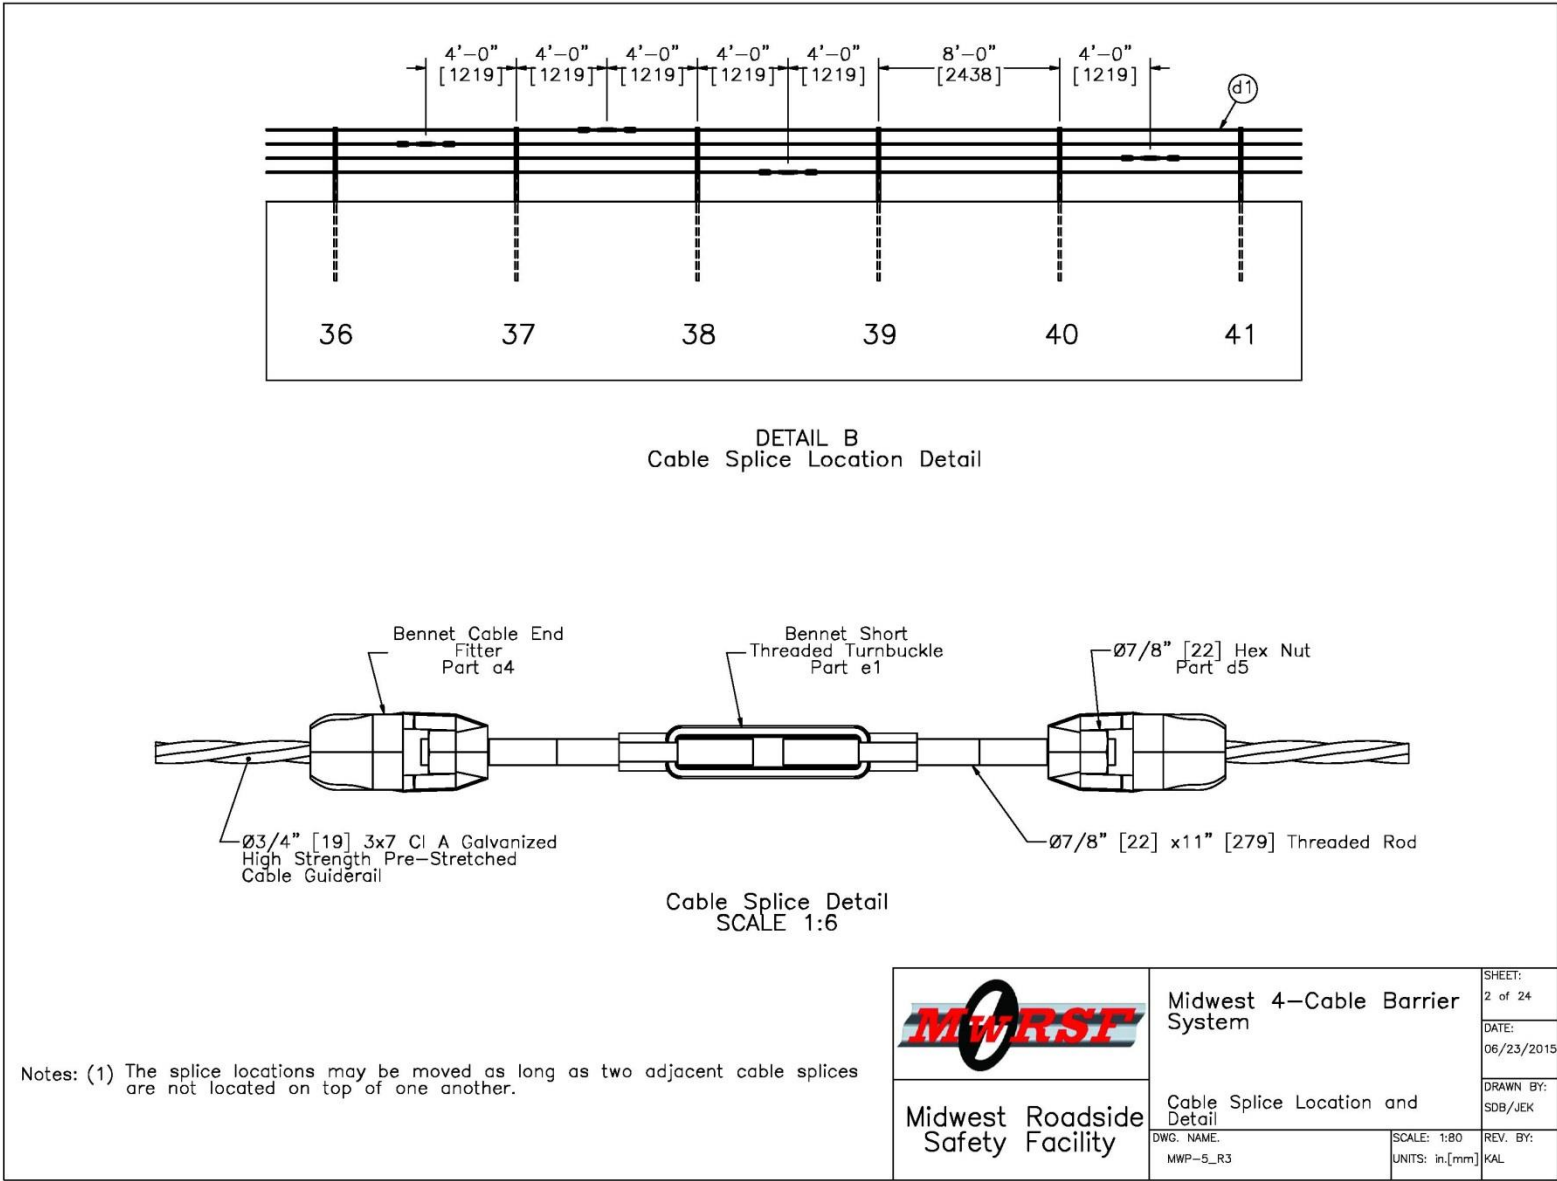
Cable Splice Location and Detail, Test No. MWP-6
